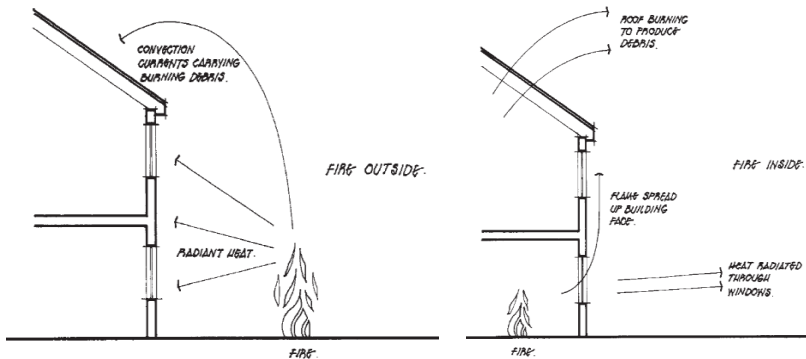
Envelope protection (a-fire outside, b-fire inside) [4]
